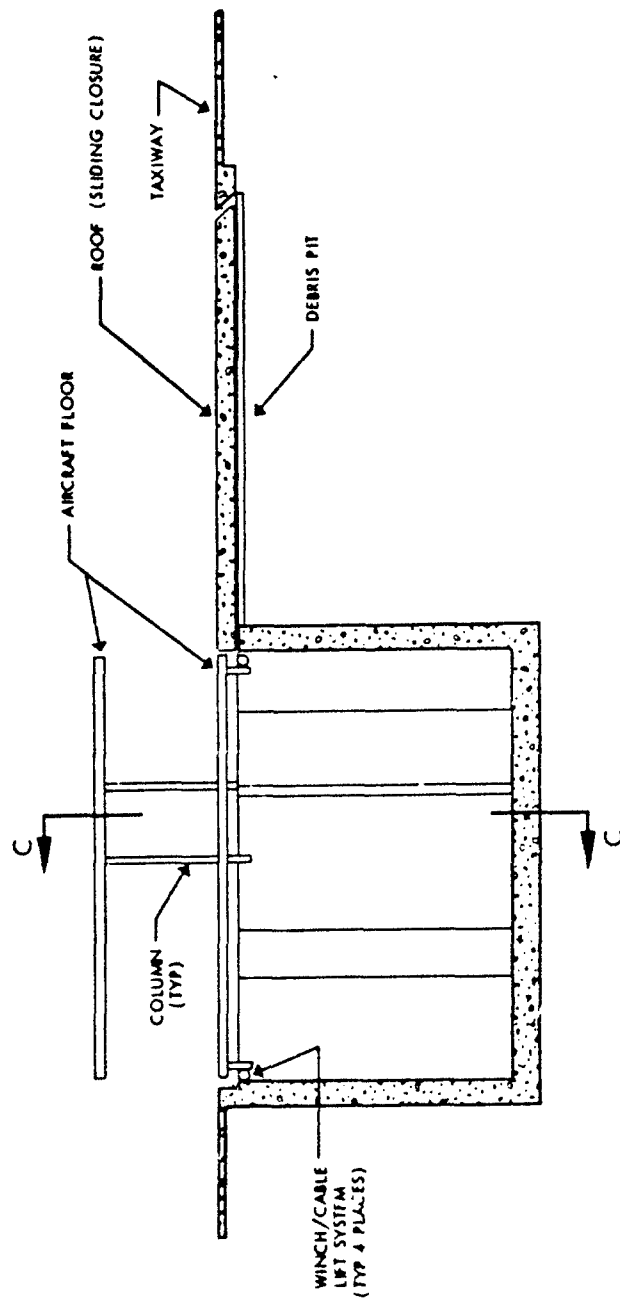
Multiple Parking Concept - Roof Closed, Floor Lowered
